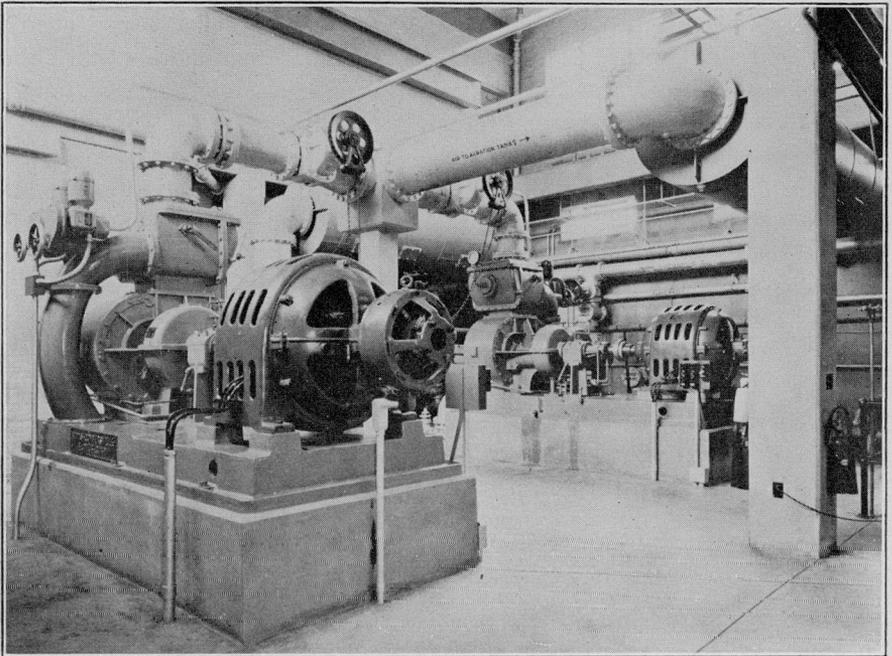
ROTARY TYPE BLOWERS WHICH FURNISH COMPRESSED AIR FOR AERATION TANKS AT SEWAGE TREATMENT WORKS.
